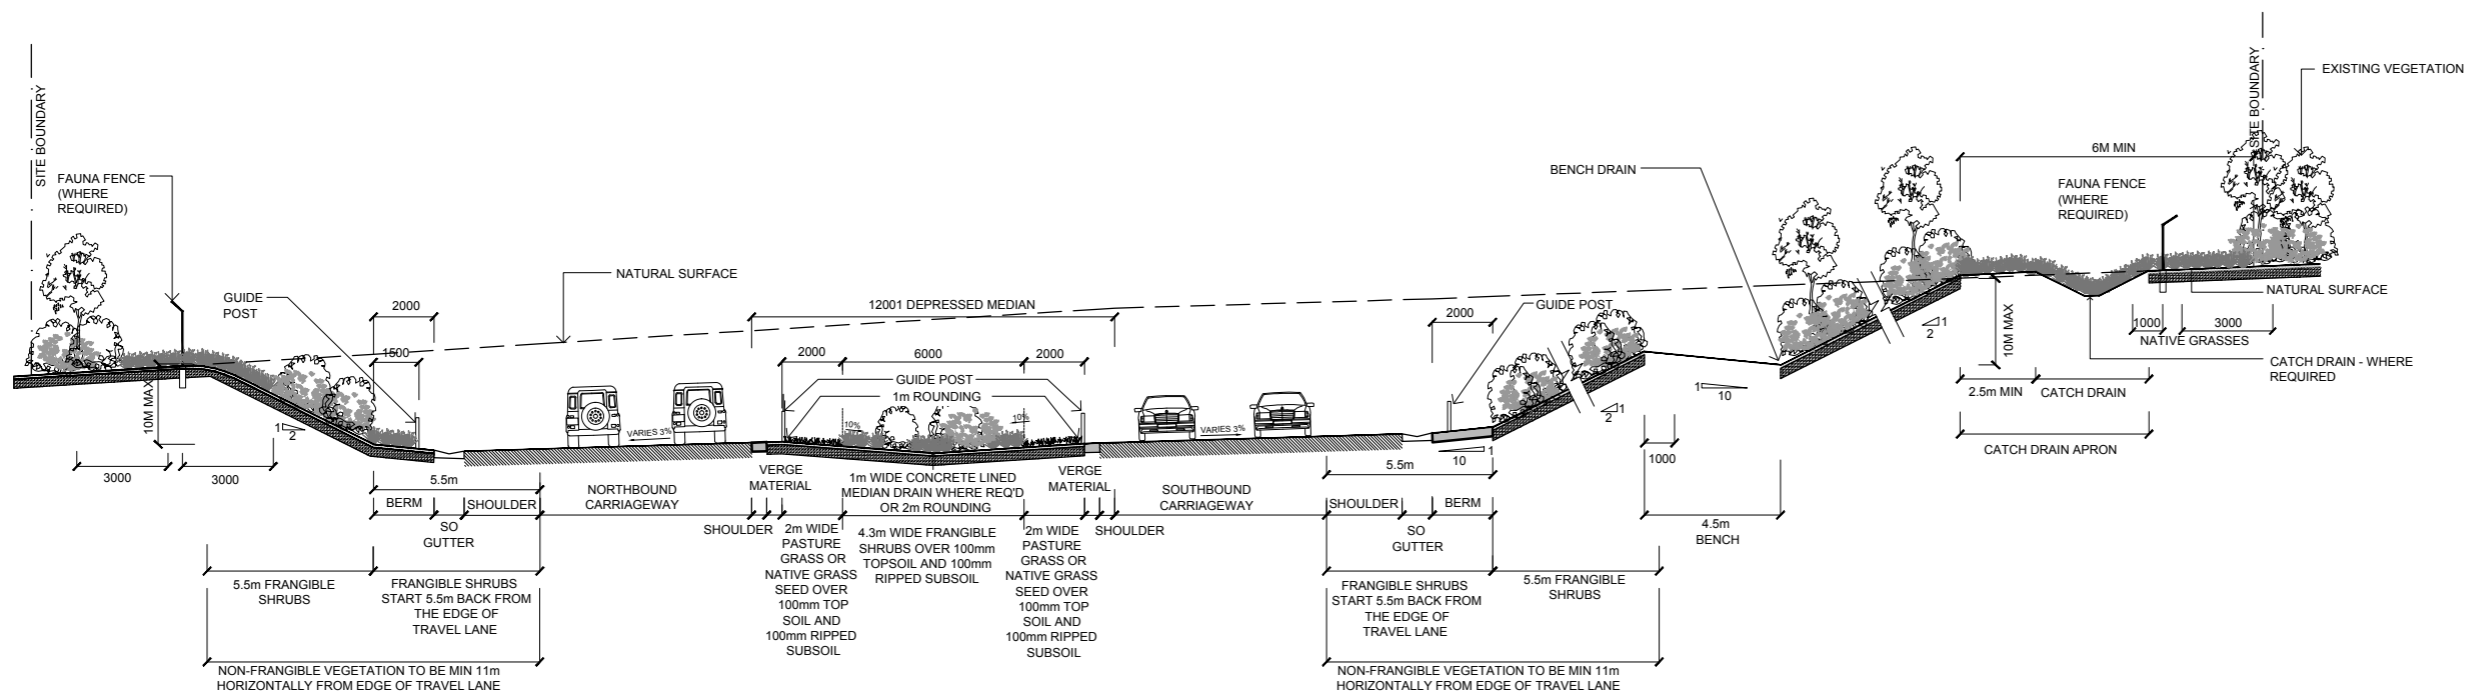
Typical Cross Section 8: Typical deep cutting > 10m high with 2:1 batters - on superelevation
